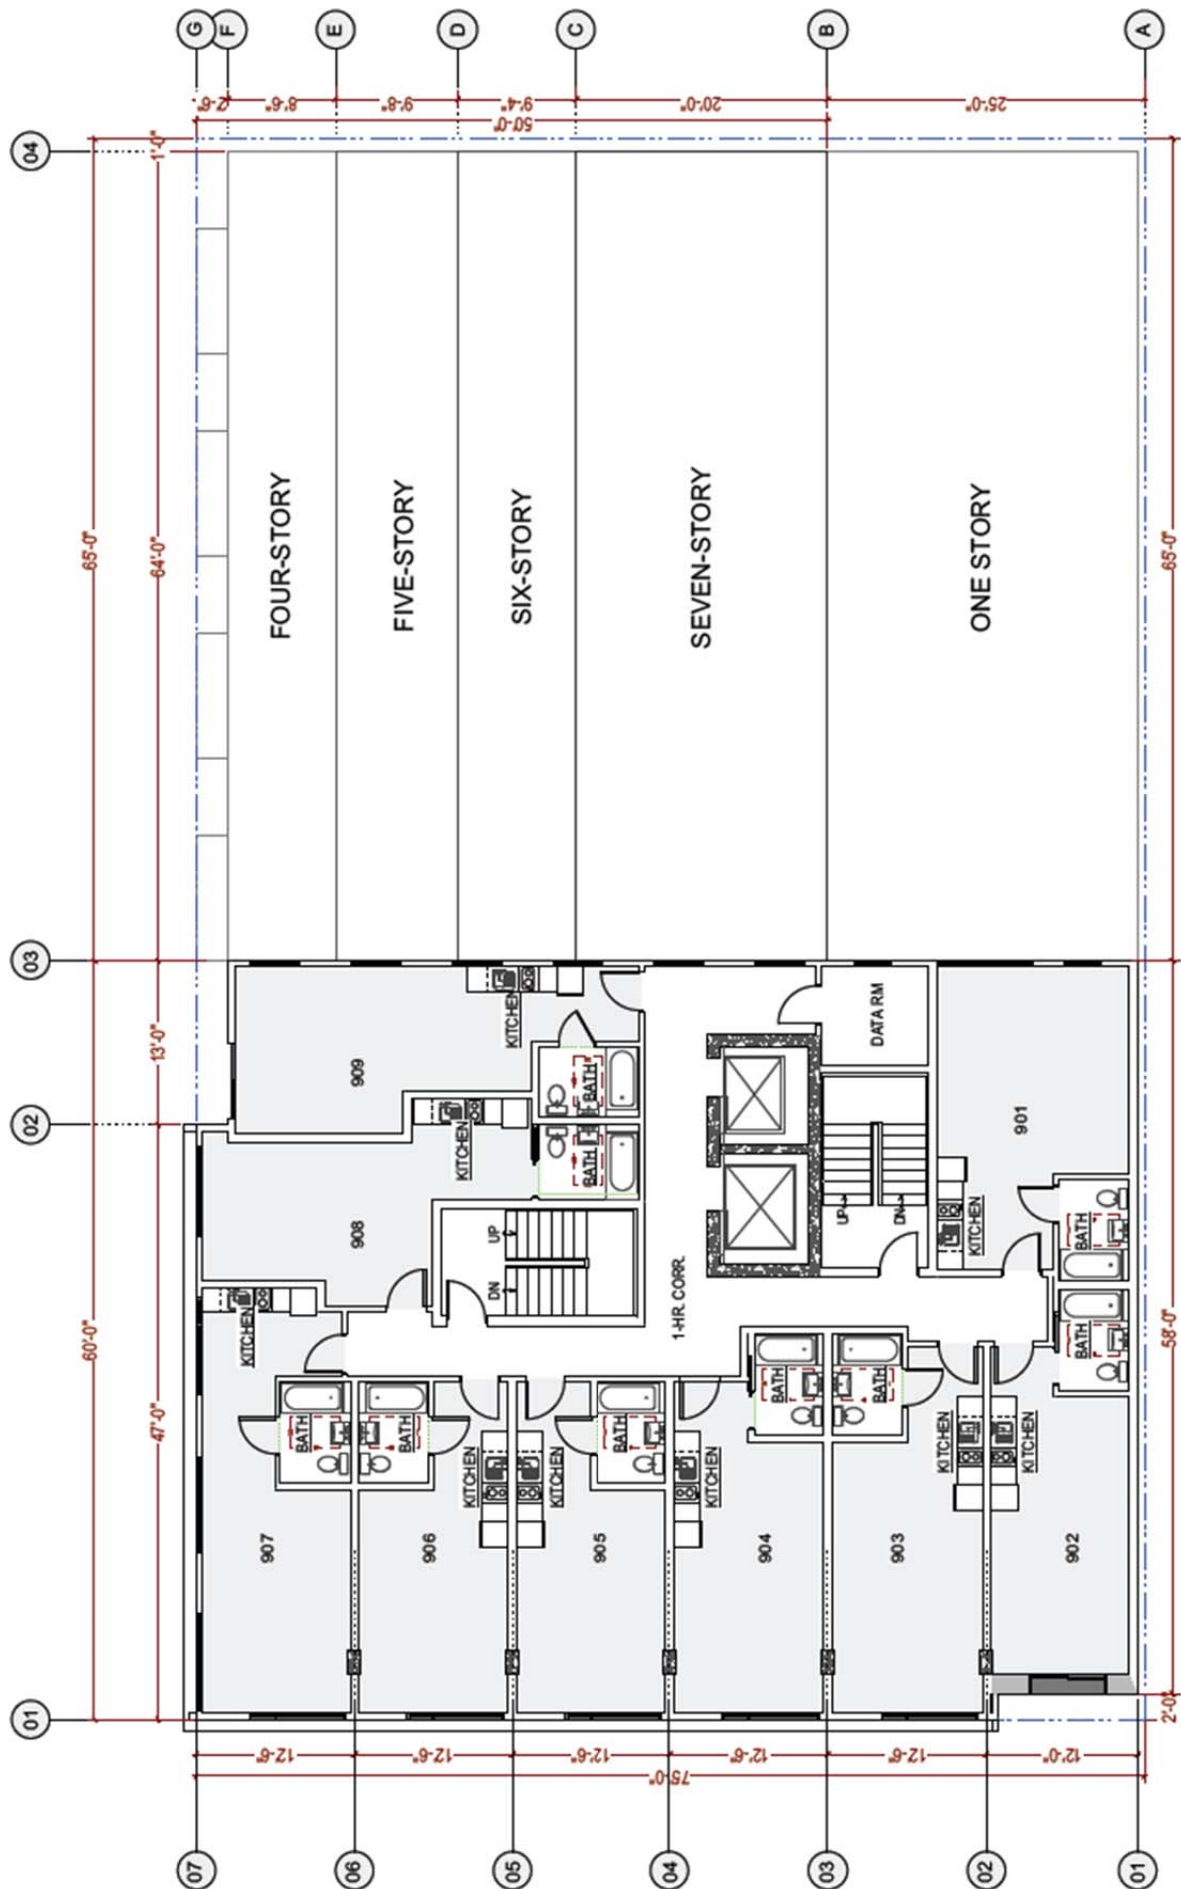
PROPOSED NINTH FLOOR PLAN
